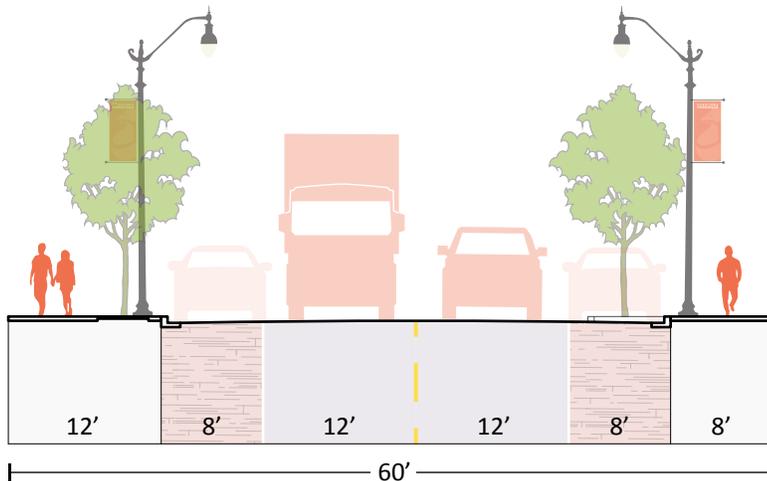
C (1). Van Emmon Street (Long-term).
